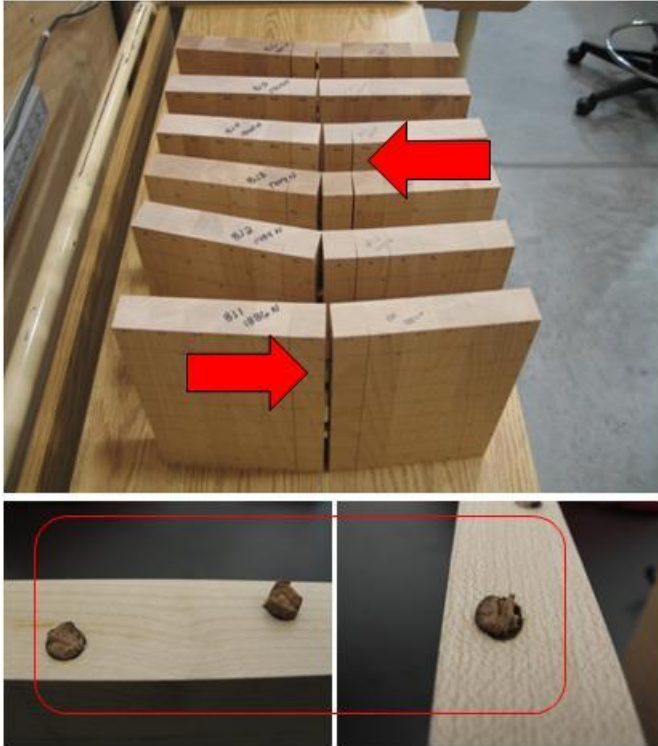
Failure of a wood-welded panel in the joints at the midspan or in the lamination next to it following bending tests (top picture). Fractured dowels with no slippage along the welded interface (bottom pictures).
